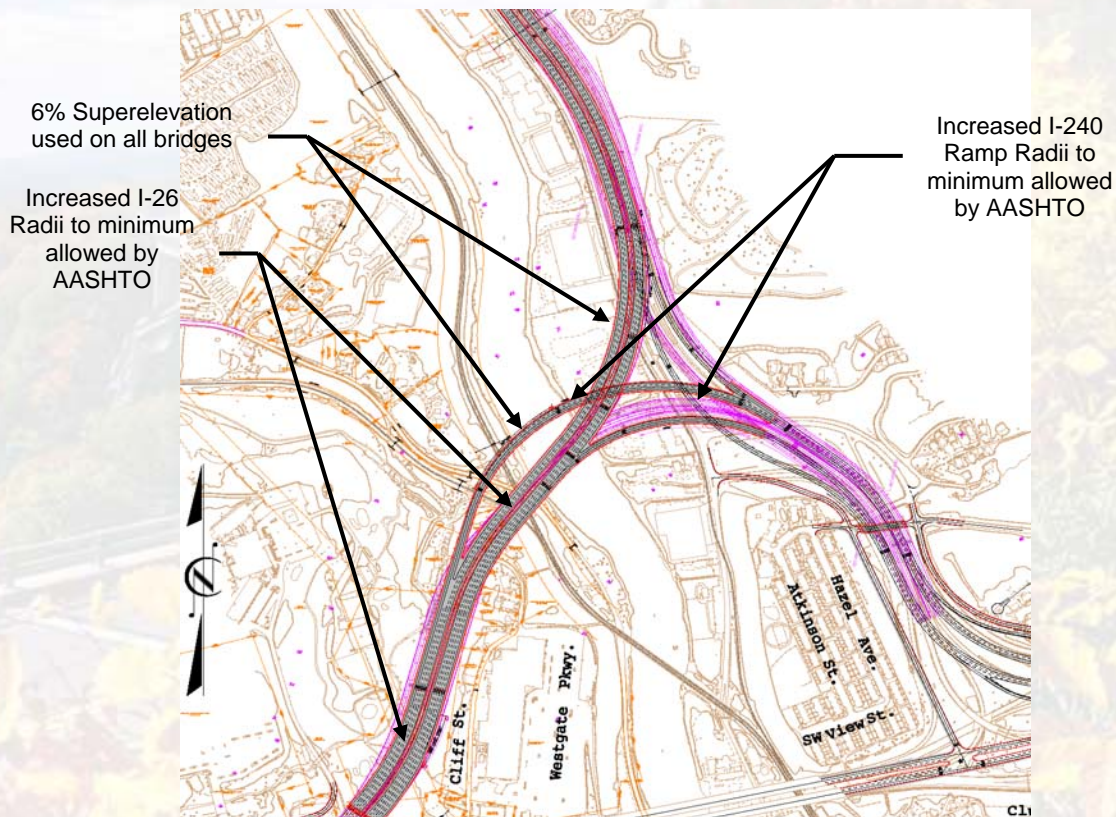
Alternative 4B Revised French Broad River Crossing Concept
